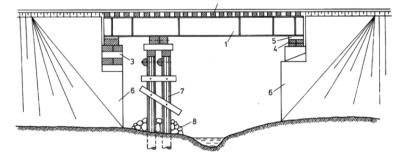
Reconstruction of a single-span bridge (Miklin & Sawicki, 1993): 1 – bridge span raised to its original position, 2 – railway superstructure, 3 – hardwood packs, 4 – steel ties, 5 – steel washers, 6 – bridge abutment bodies, 7 – additional pile support due to weakening of the span structure, 8 – armour rock.
